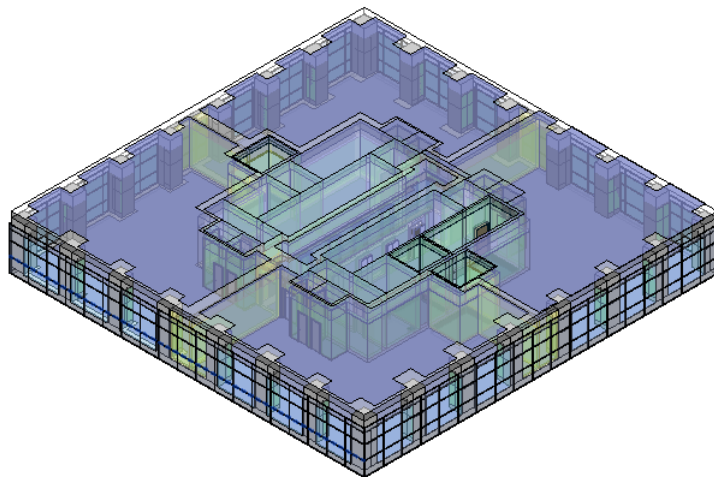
3D view of typical floor demonstrates the setting of the office's area (Revit software).
